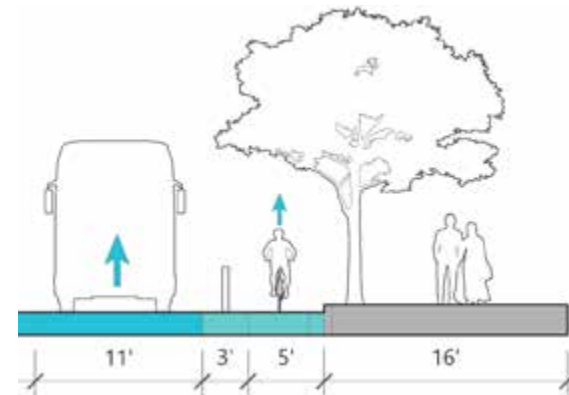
Bus on a Typical Arterial Street with On-Street Parking and a One-Way, Sidewalk-Level Class IV Bikeway.
